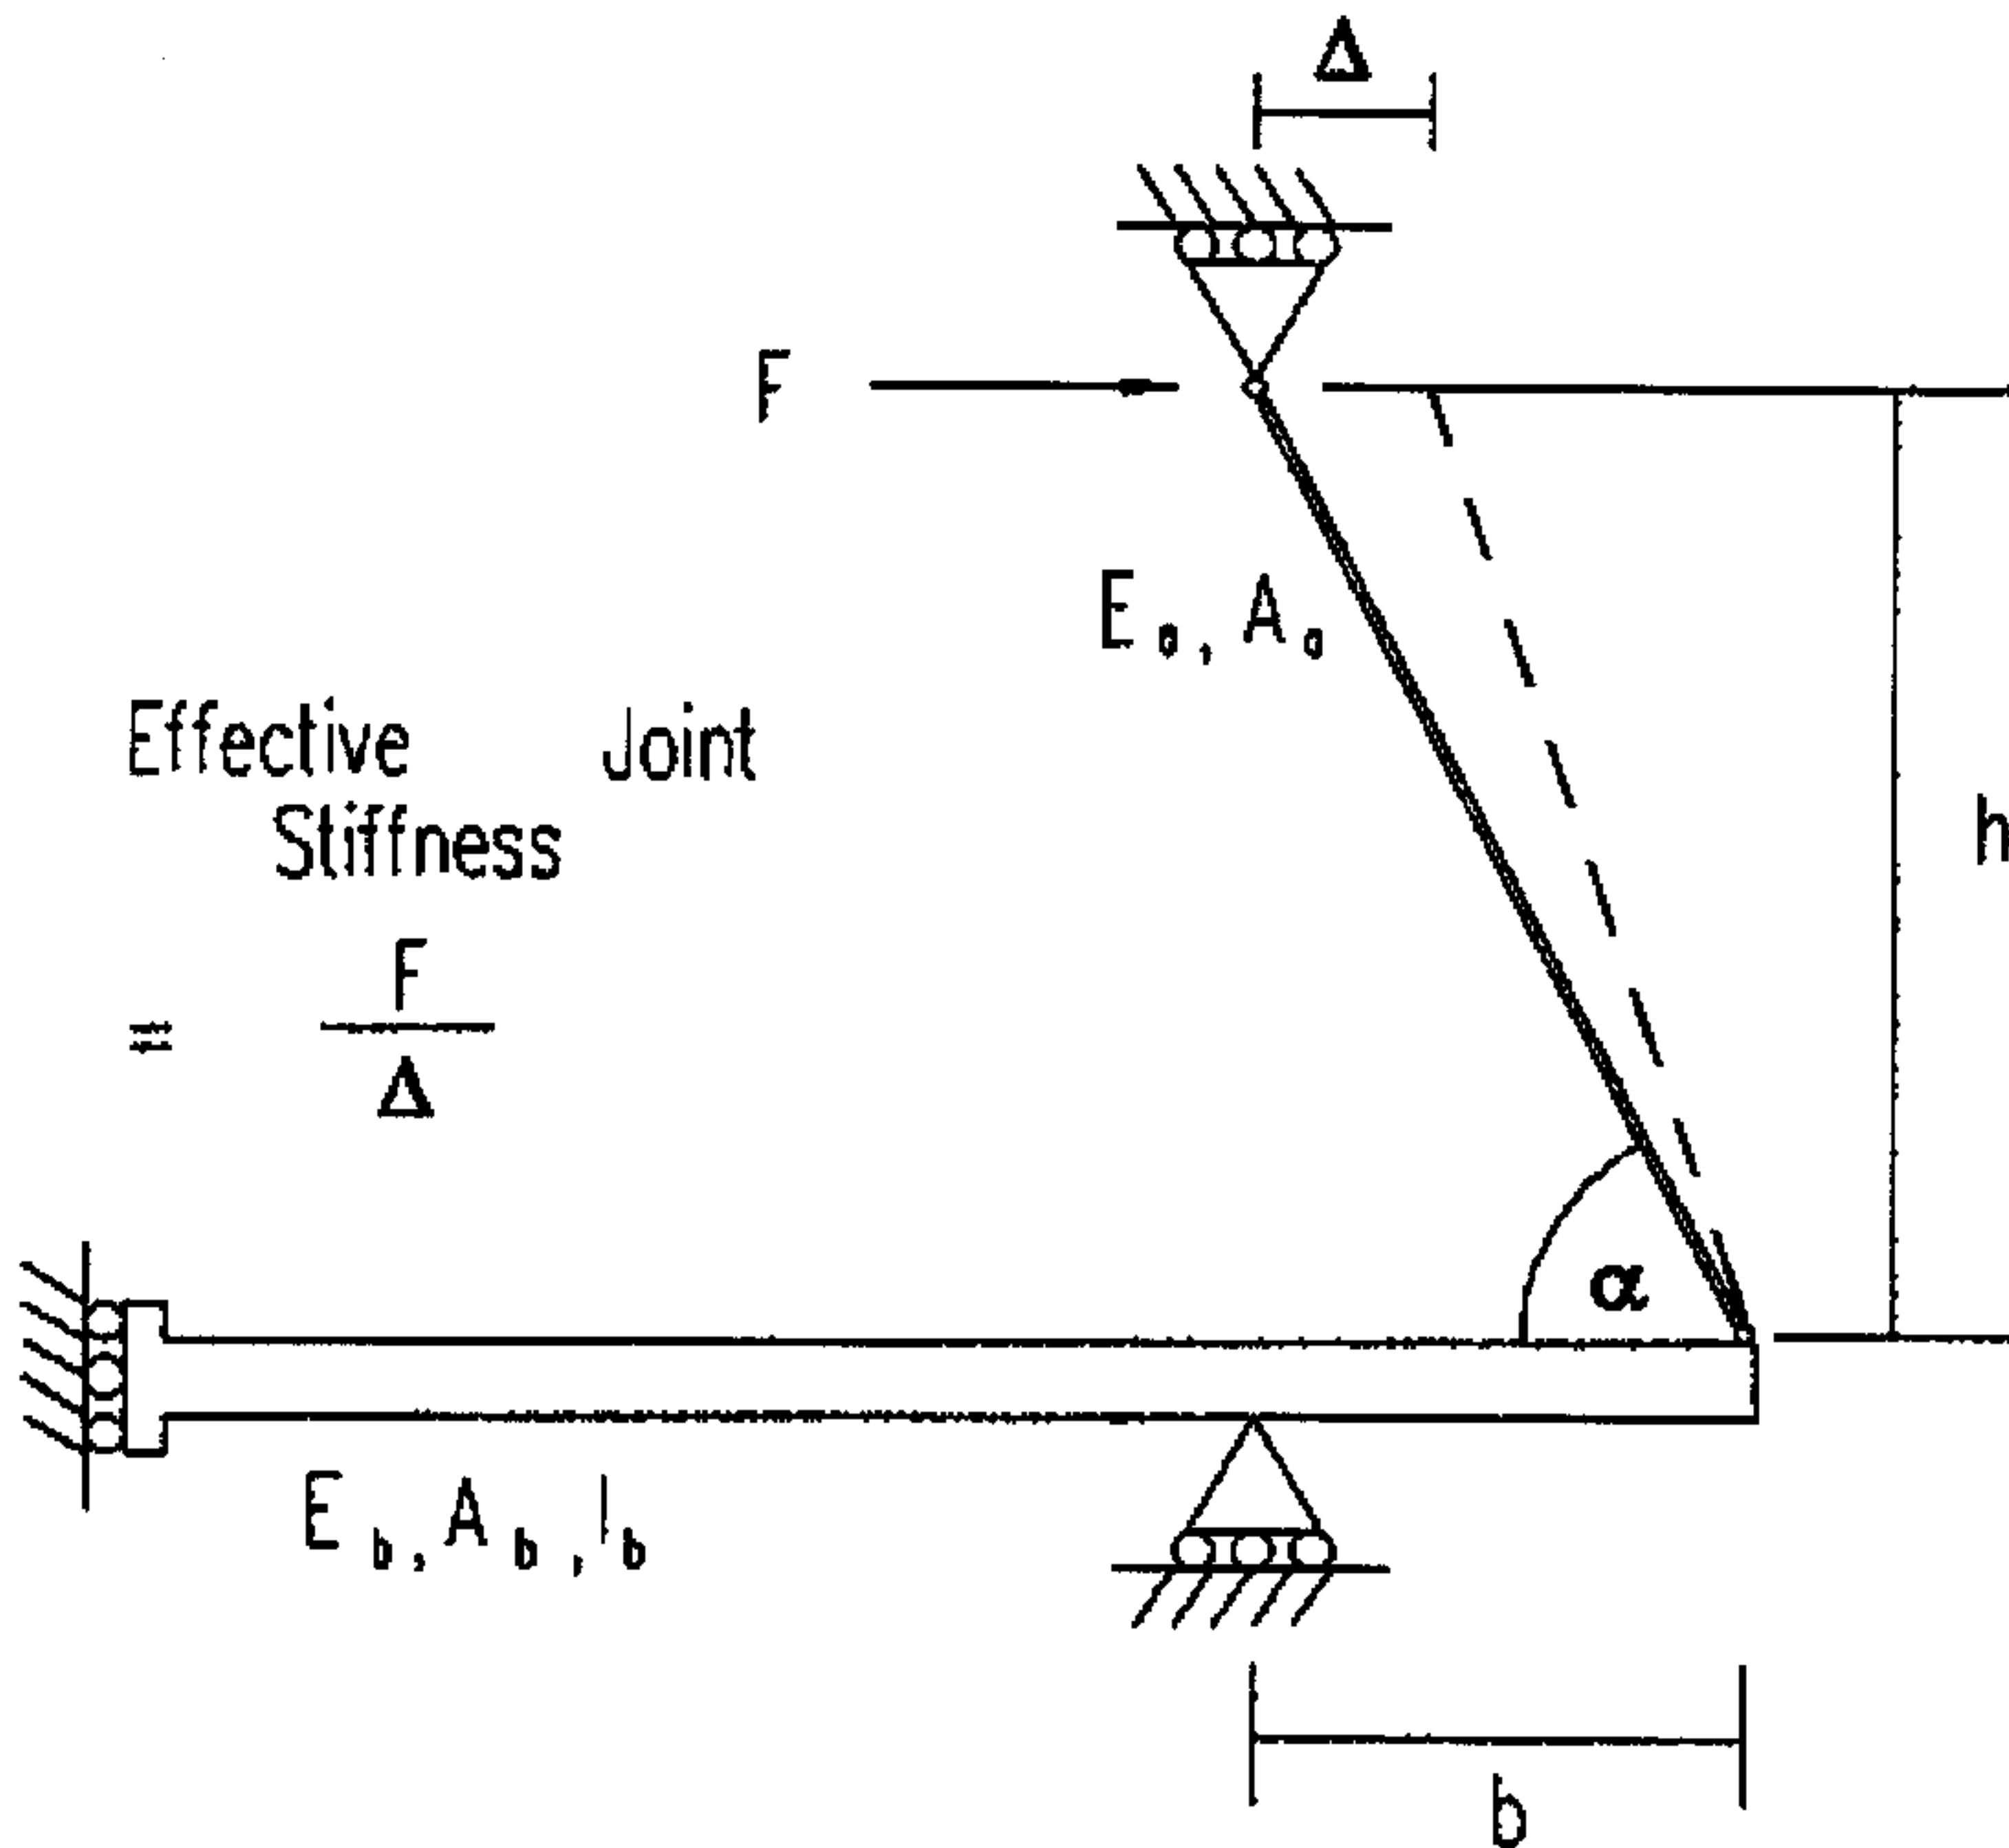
Outrigger bracing model for the Fremont Mill and Fort Laramie bridges. Parameters affecting the outrigger's efficiency are the floor beam properties E_b , I_b , and A_b ; the outrigger member properties E_o and A_o ; and the outrigger height h and length b .
